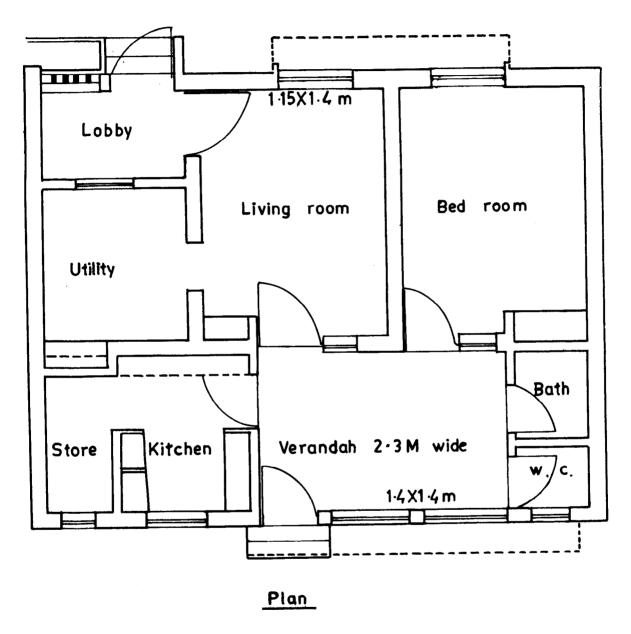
PLAN OF A TYPICAL TWO ROOM HOUSE
